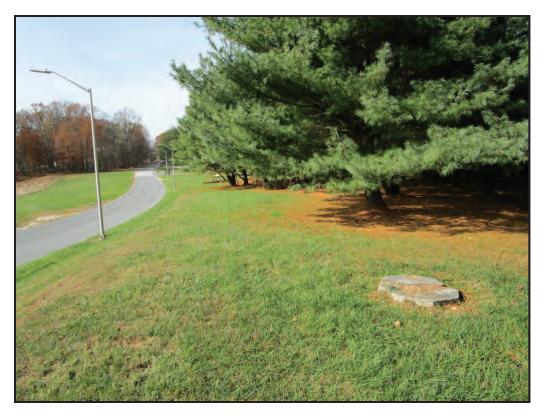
Area Along Rue Saint Lo Drive Showing Road Berm and Concrete Manhole for Utilities, Facing West
